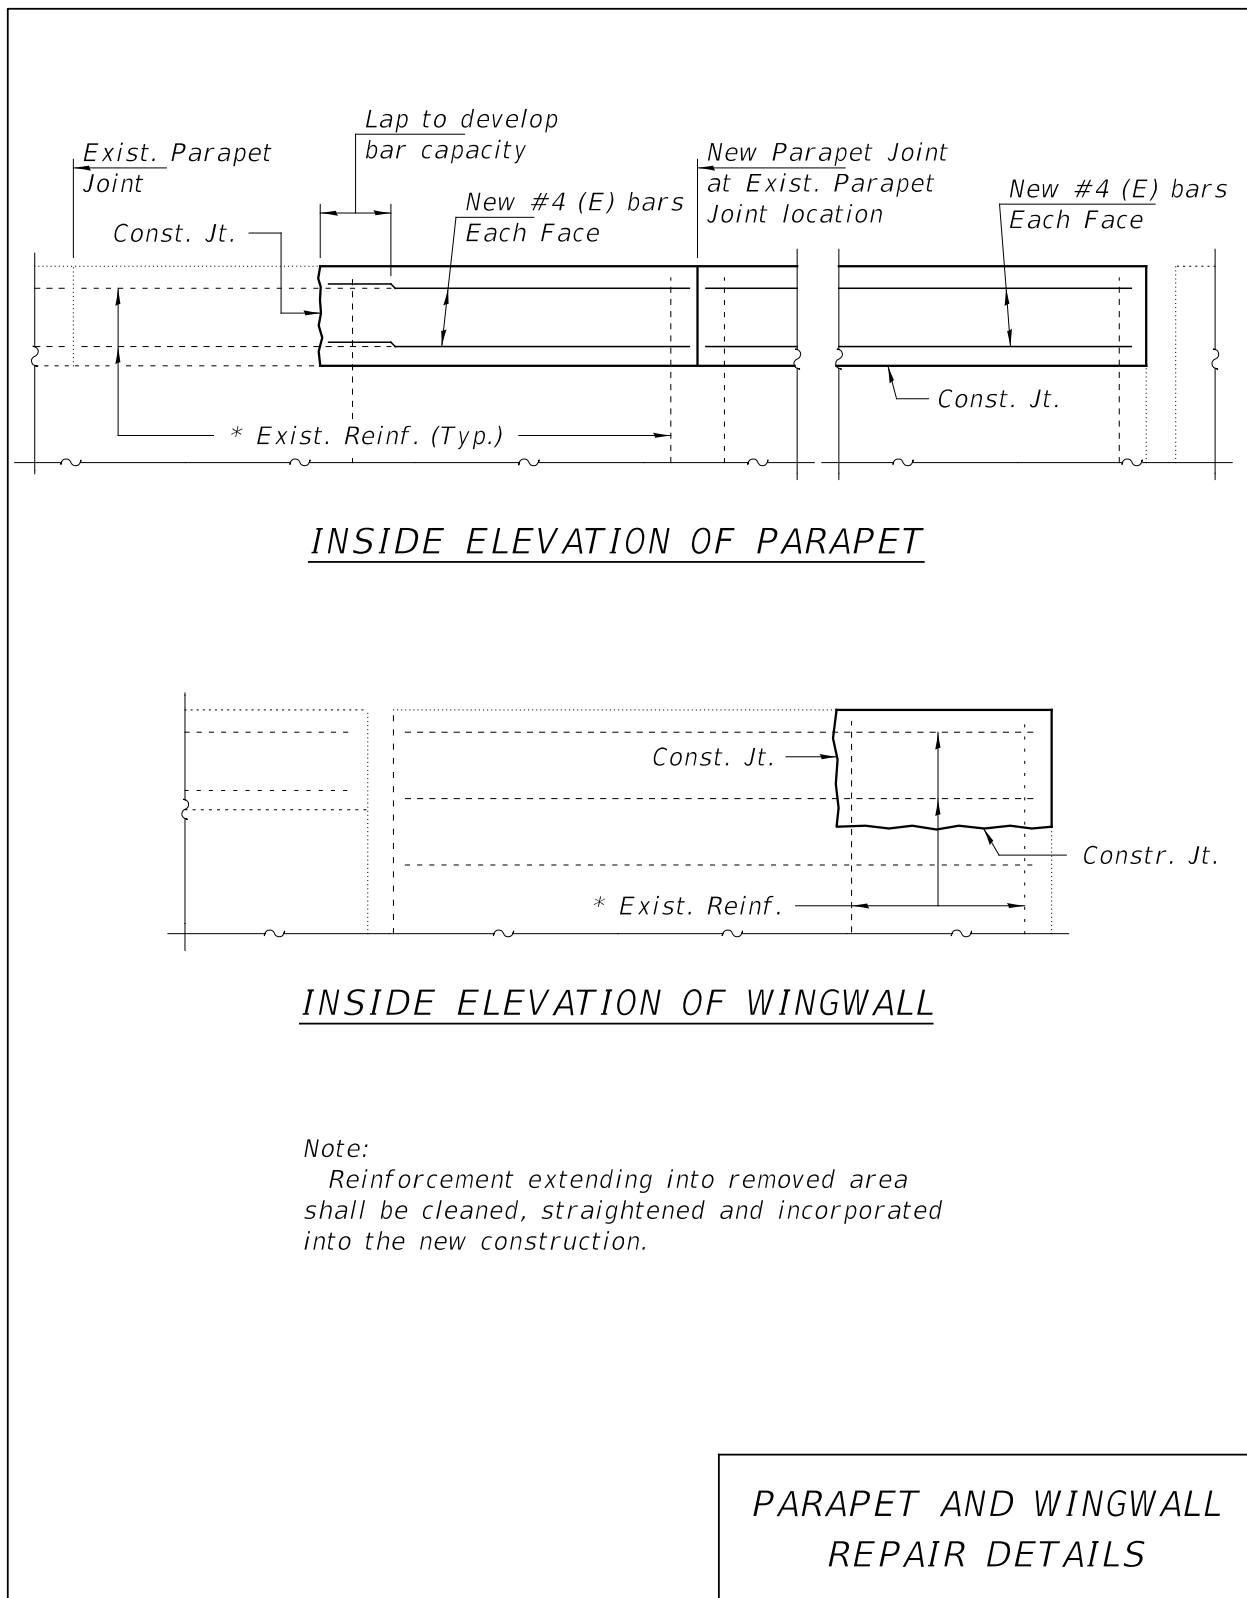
Parapet and Wingwall Repair Details
